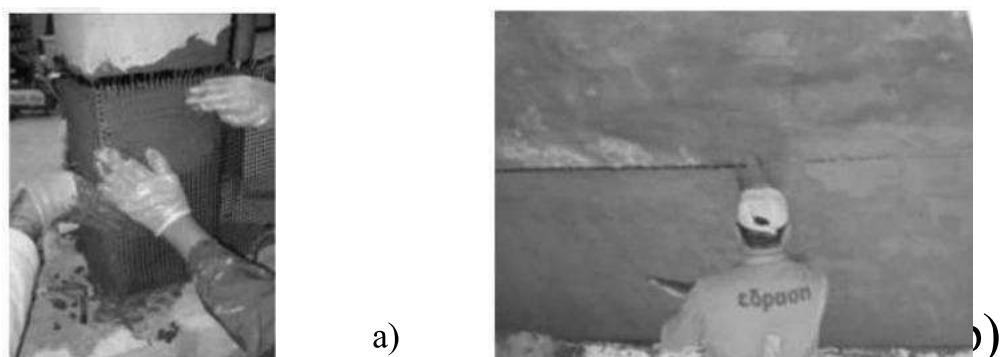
(a) Textile-reinforced mortar (TRM) jacketing at the base of an RC column; (b) Strengthening of RC slab with TRM
